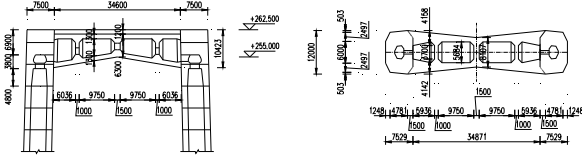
The structure of the upper beam at the east cable tower on Lingdingyang Bridge
